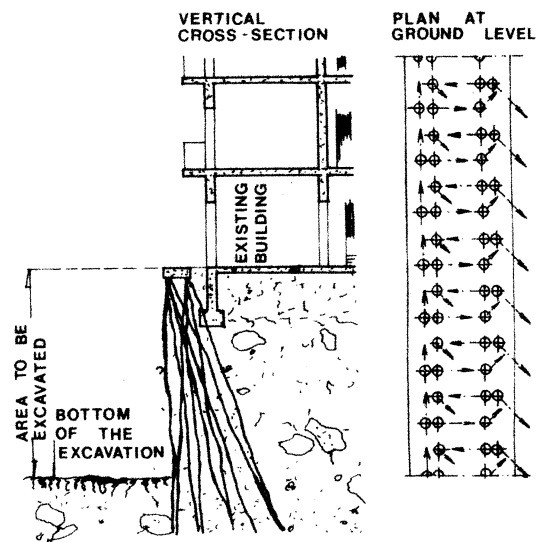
Typical scheme of RRP (Lizzi, 1982)
